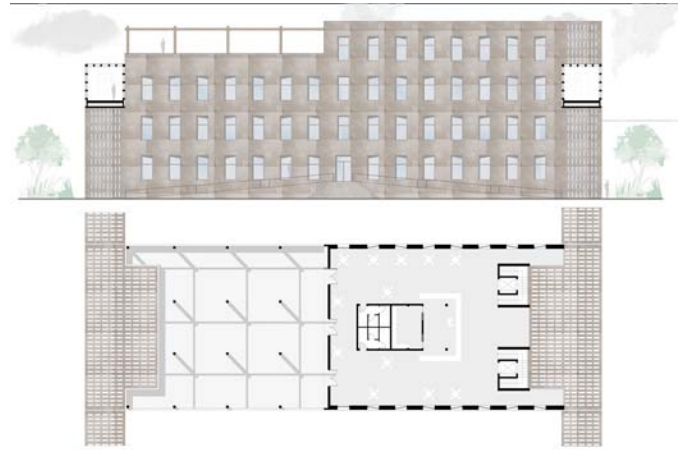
Plan and longitudinal section of the building. Students: Kristiana Kumi, Bruno Surfaro, Tirana, June 2017
